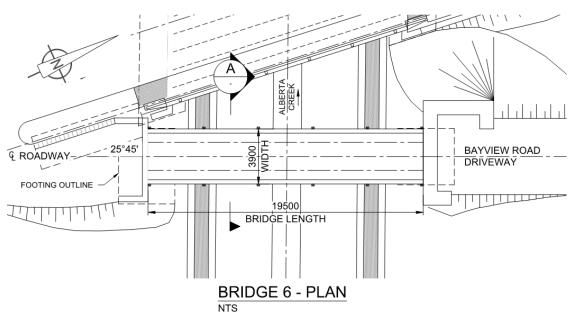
Bayview Road Bridge over Alberta Creek (Driveway) – Plan
